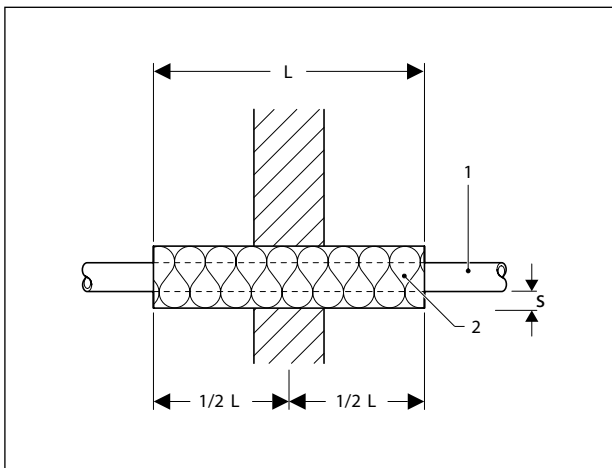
Fire protection, Geberit Mepla  $\varnothing$  16 - 75mm: Wall penetration, solid wall
